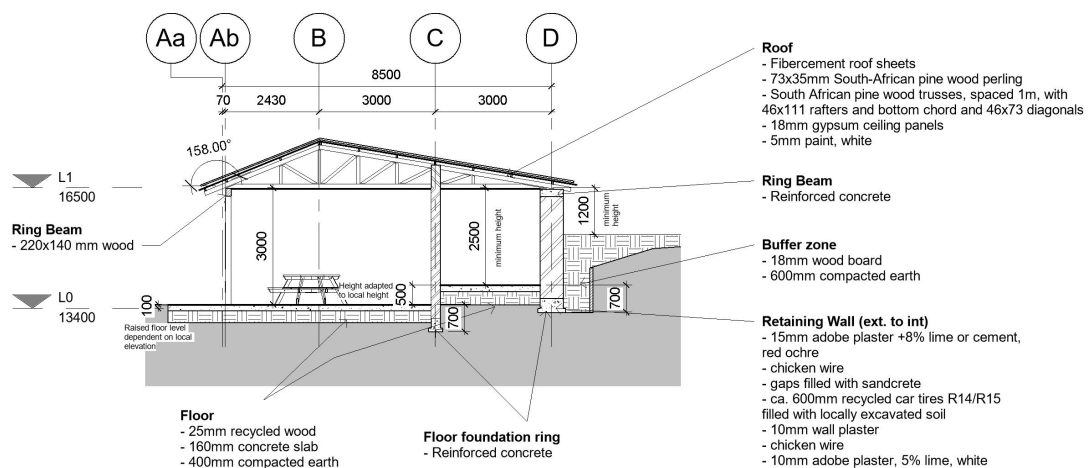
Building section: clubhouse outside, original file scale 1:100
